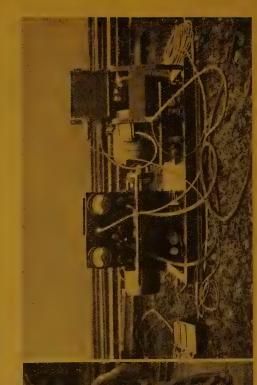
Motor-generator portable welding plant for working off live rail.
